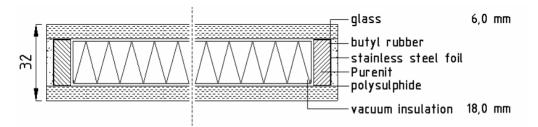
Cross-section of a façade element. In some elements, one pane of glass was exchanged for 3 mm thick sheet aluminium and the other pane of glass was 8 mm thick.
